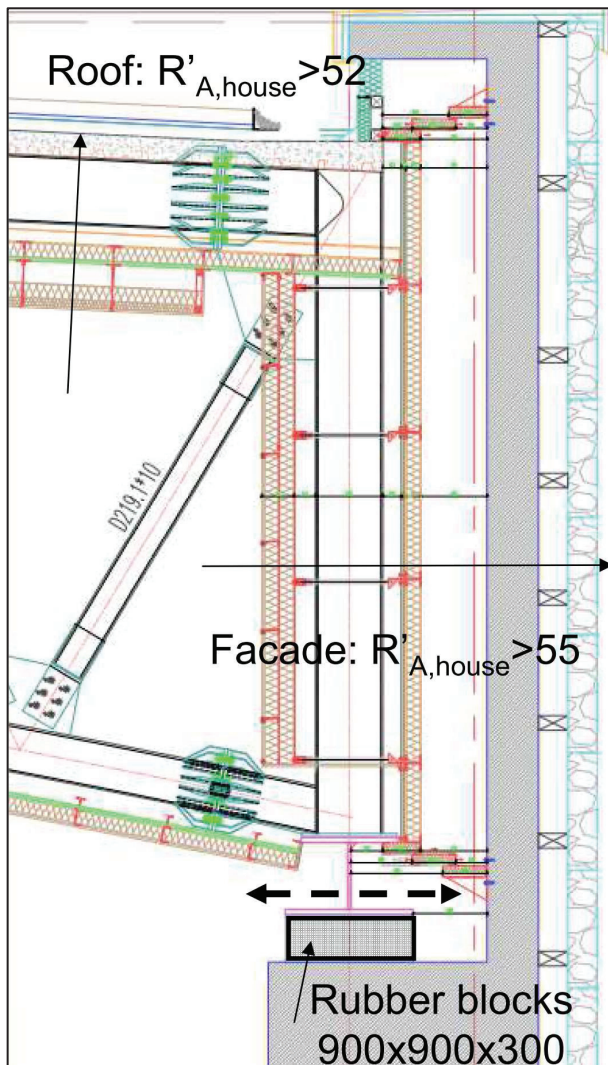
Edge detail of roof (on elastic bearings) and façade of the Volkswagen Arena in Istanbul.
